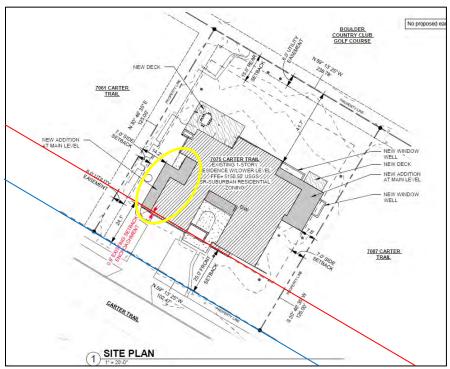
Site Plan showing existing and proposed improvements, 25-foot setback boundary indicated by the red line and front property line indicated by the blue line. The proposed residential addition is indicated by dark shading on the plan. Only the addition on the left is subject of this variance request (circled in yellow).
